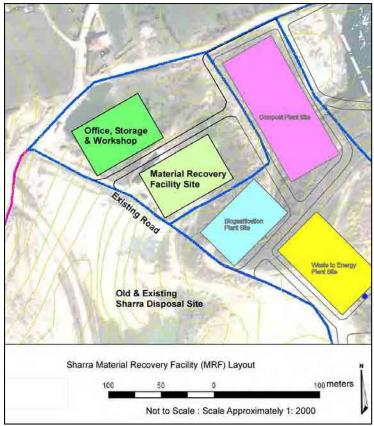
Proposed Layout of Central MRF and Office Building
